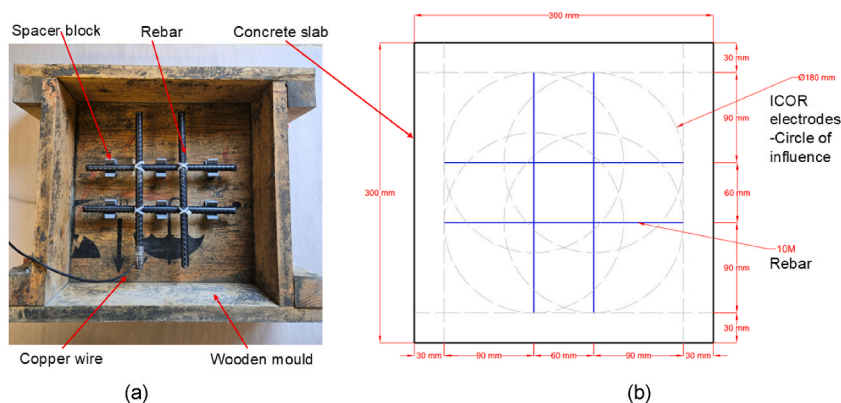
(a) Rebar layout for corrosion testing, and (b) Schematic sketch of rebar design in the slab.
